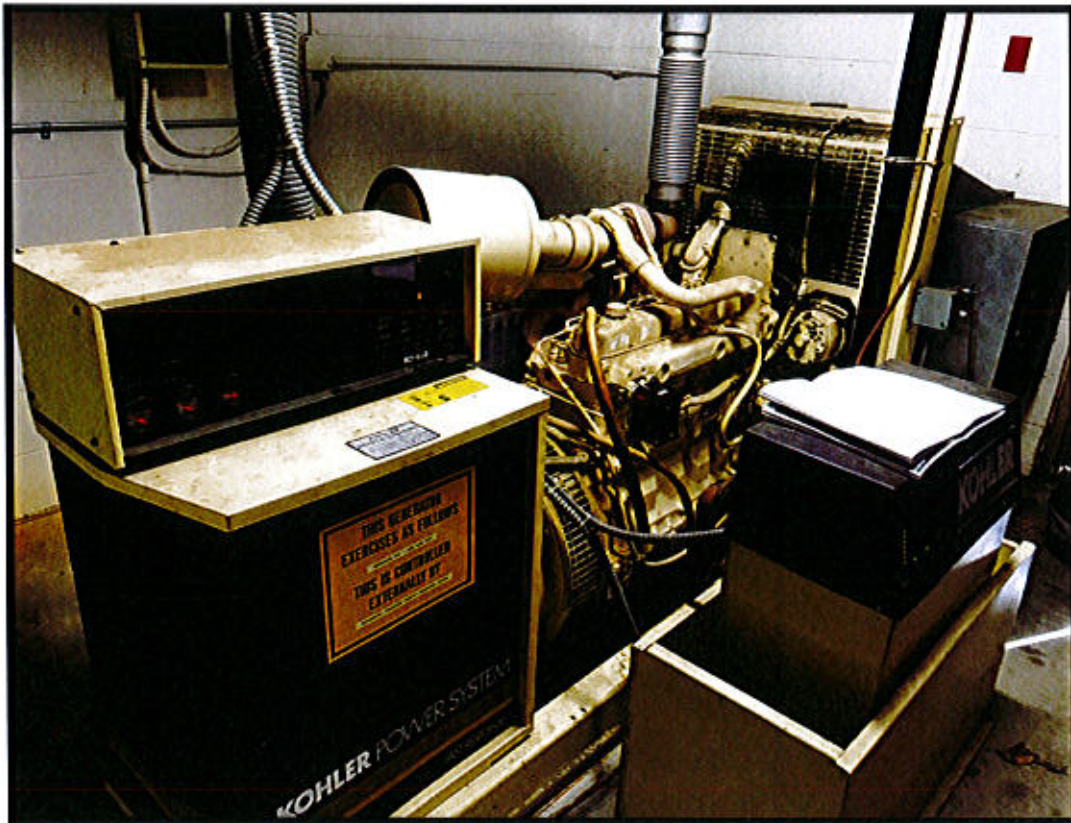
Haddam Maintenance Facility – Saybrook Road, Haddam, CT.
